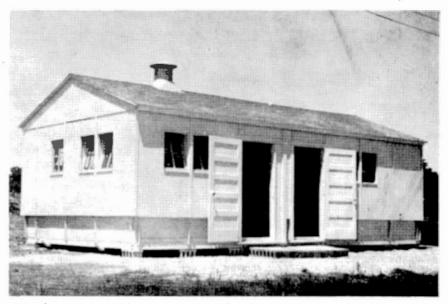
Portable Grade A milking barn at farm site near Bristow, Oklahoma. The lower part of the structure is welded steel. The upper walls are exterior type 3/8 inch fir plywood on 2×4 inch framing.
